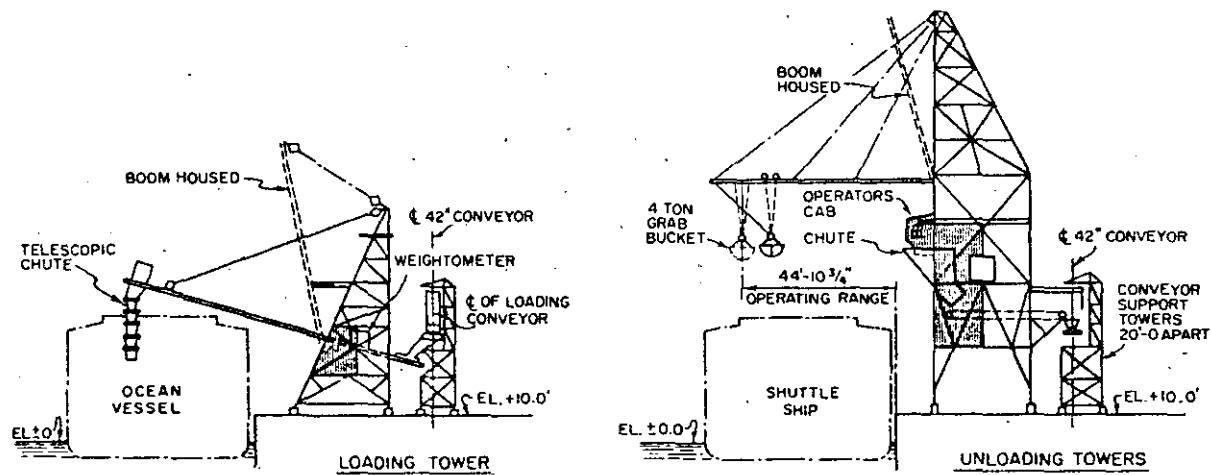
(b) Typical sections of loading and unloading facilities at bauxite transfer station, Chaguaramas Bay, Trinidad, British West Indies.
